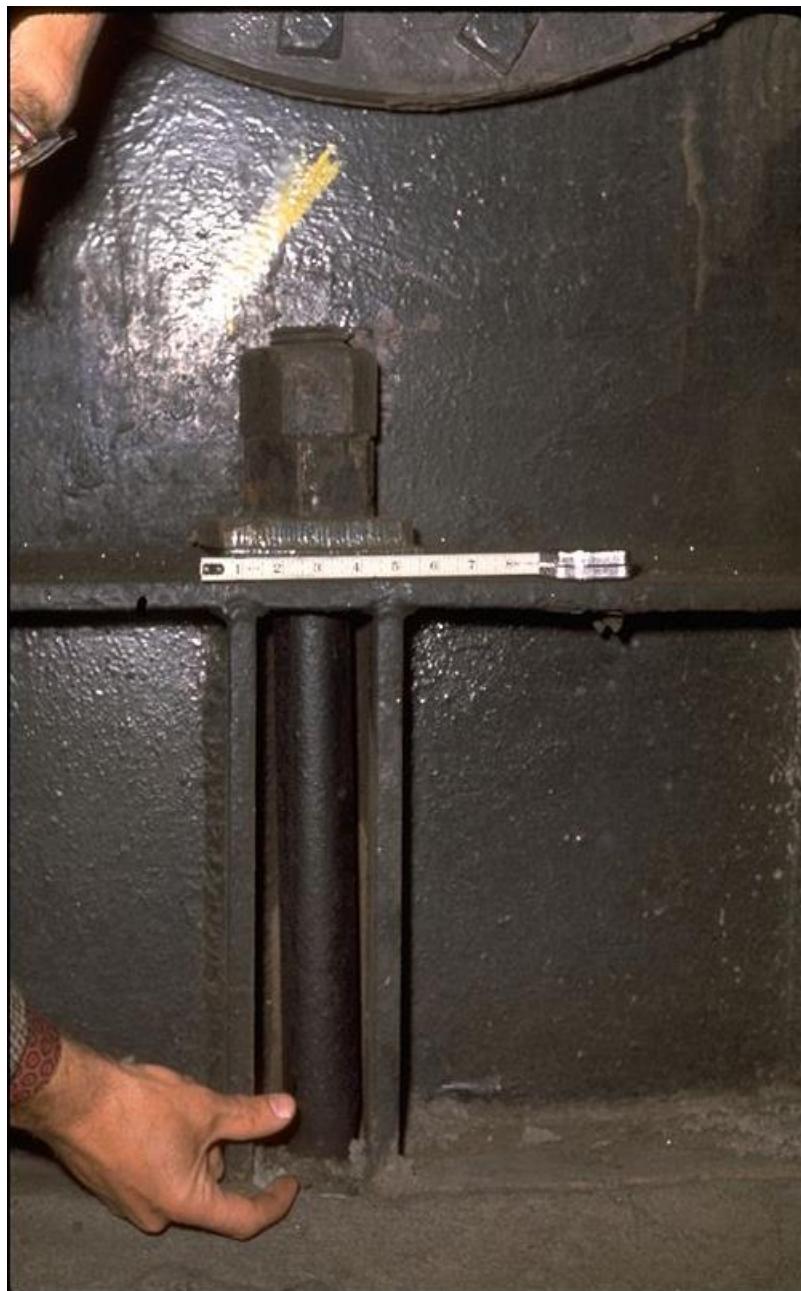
Anchor bolt stretch in 1960 Mw 9.5 earthquake, Huachipato Steel Plant. (Source: Courtesy of K. Steinbrugge, NISEE)
